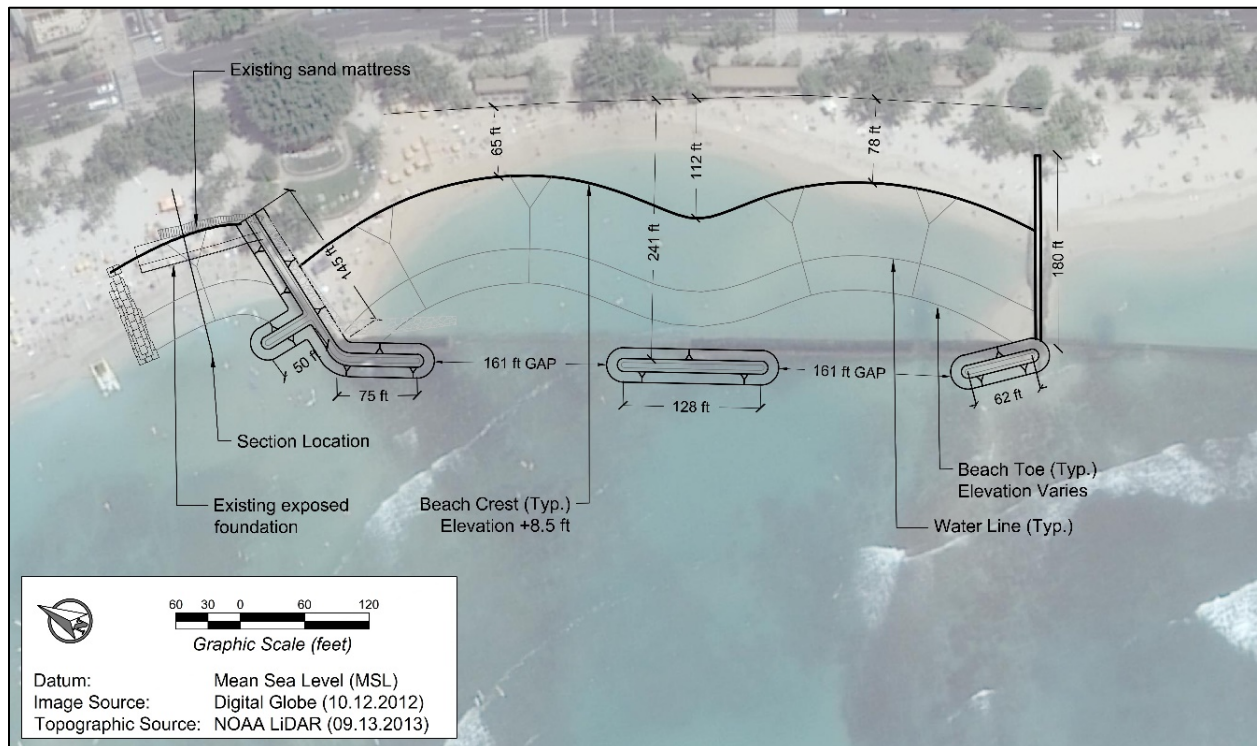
Conceptual layout for proposed action - Kūhiō beach sector ‘Ewa (west) basin
